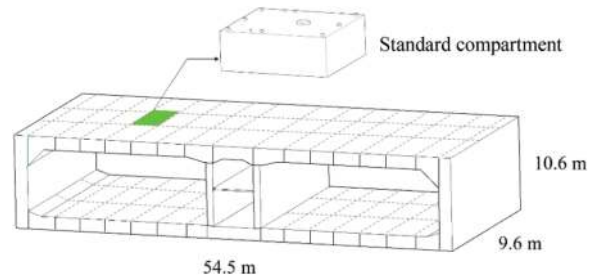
Full-scale model and compartment partitioning of steel shell SSIT section.
